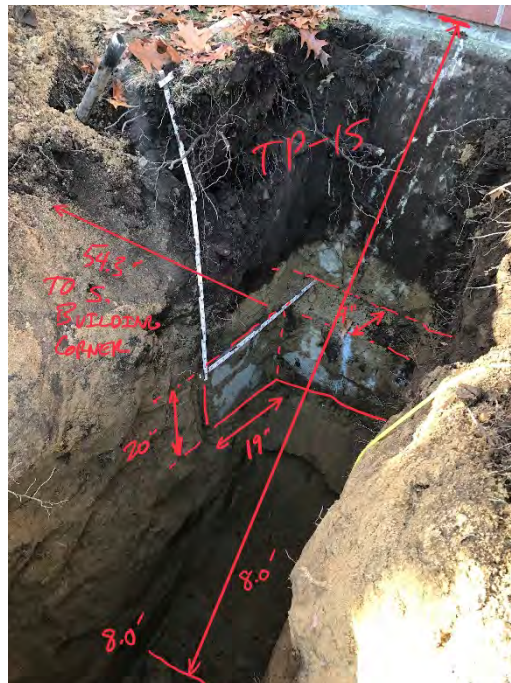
Another view of test pit HA21-TP15 at a different angle, showing exposed existing building foundation.
